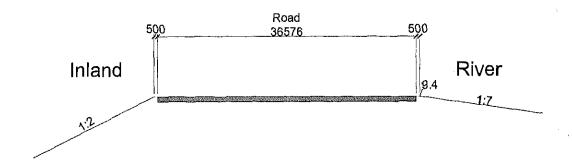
Cross Sectional View of Proposed Embankment
